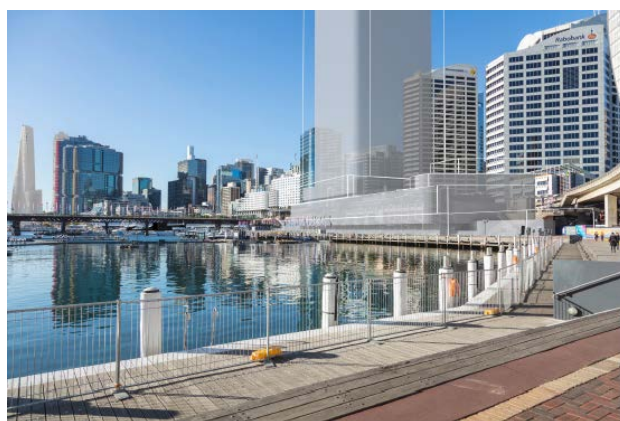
Concept Envelope and building mass currently envisaged (Southern Shore of Cockle Bay)
